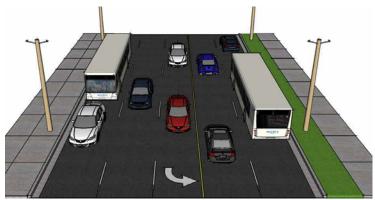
Typical Cross Section Looking North -Almon Street to Young Street
